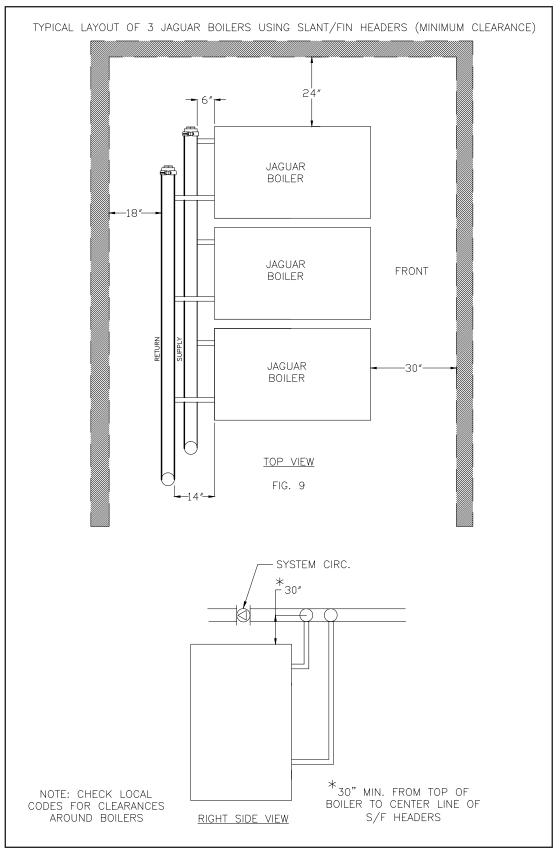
Typical layout of 3 Jaguar Boilers using Slant/Fin Headers (Minimum Clearance)
